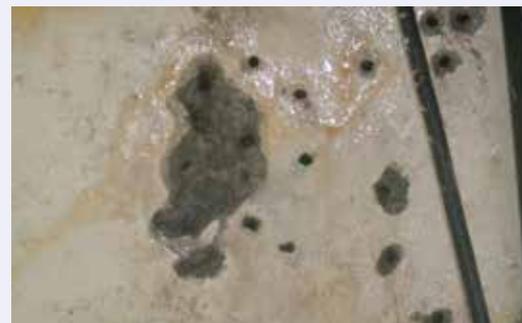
Water dripping and accumulation on the surface of a roof slab
